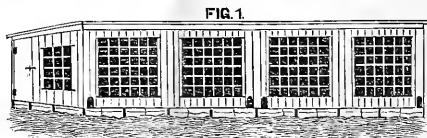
, of accompanying draft, shows the front elevation. Figure 2, the plan of floor. My house is 11 feet wide by 40 feet long. (Mr. Adams can reduce the scale and make his 10 by 32.) The house faces the southeast; a passage three and one-half feet wide runs along the back, the entire length of the house, separated from the rest of the space by a partition of three boards high, and lath above that to the ceiling. The entrance to the house is by a door at either and each end of the passage-way. Four doors, D D, open from the passage into as many rooms, each partitioned like the passage. The nests, N N, are placed in tiers, two high, the lower tier resting on the floor, and facing the passage partition, the middle board of which is hinged; and raises up, thus allowing the eggs to be gathered from the passage. The perches, P P, are frames as shown, being about 20 inches high; the cross-bars being 18 inches apart.
